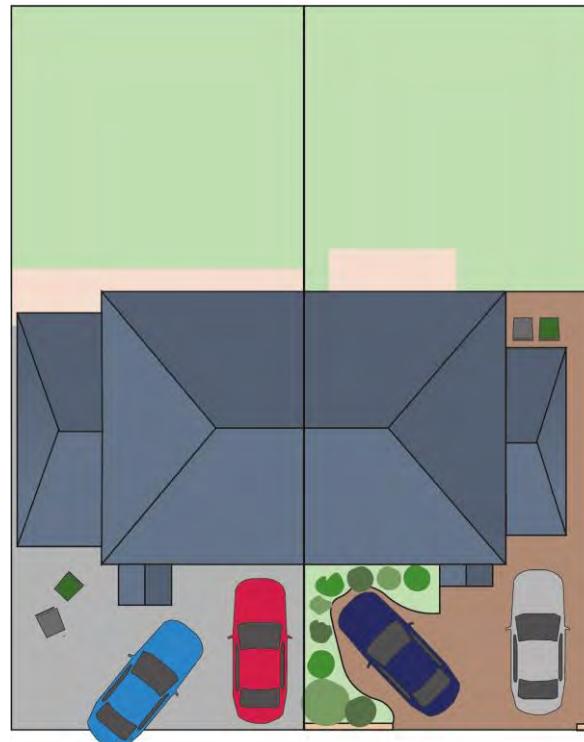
Left image is a poorly designed extension with limited hardstanding parking, poor bin storage, no access to rear garden and loss of garden boundaries. Right image is a well-designed proportionate extension with permeable parking area, planting, access to rear garden and hidden bin storage.
